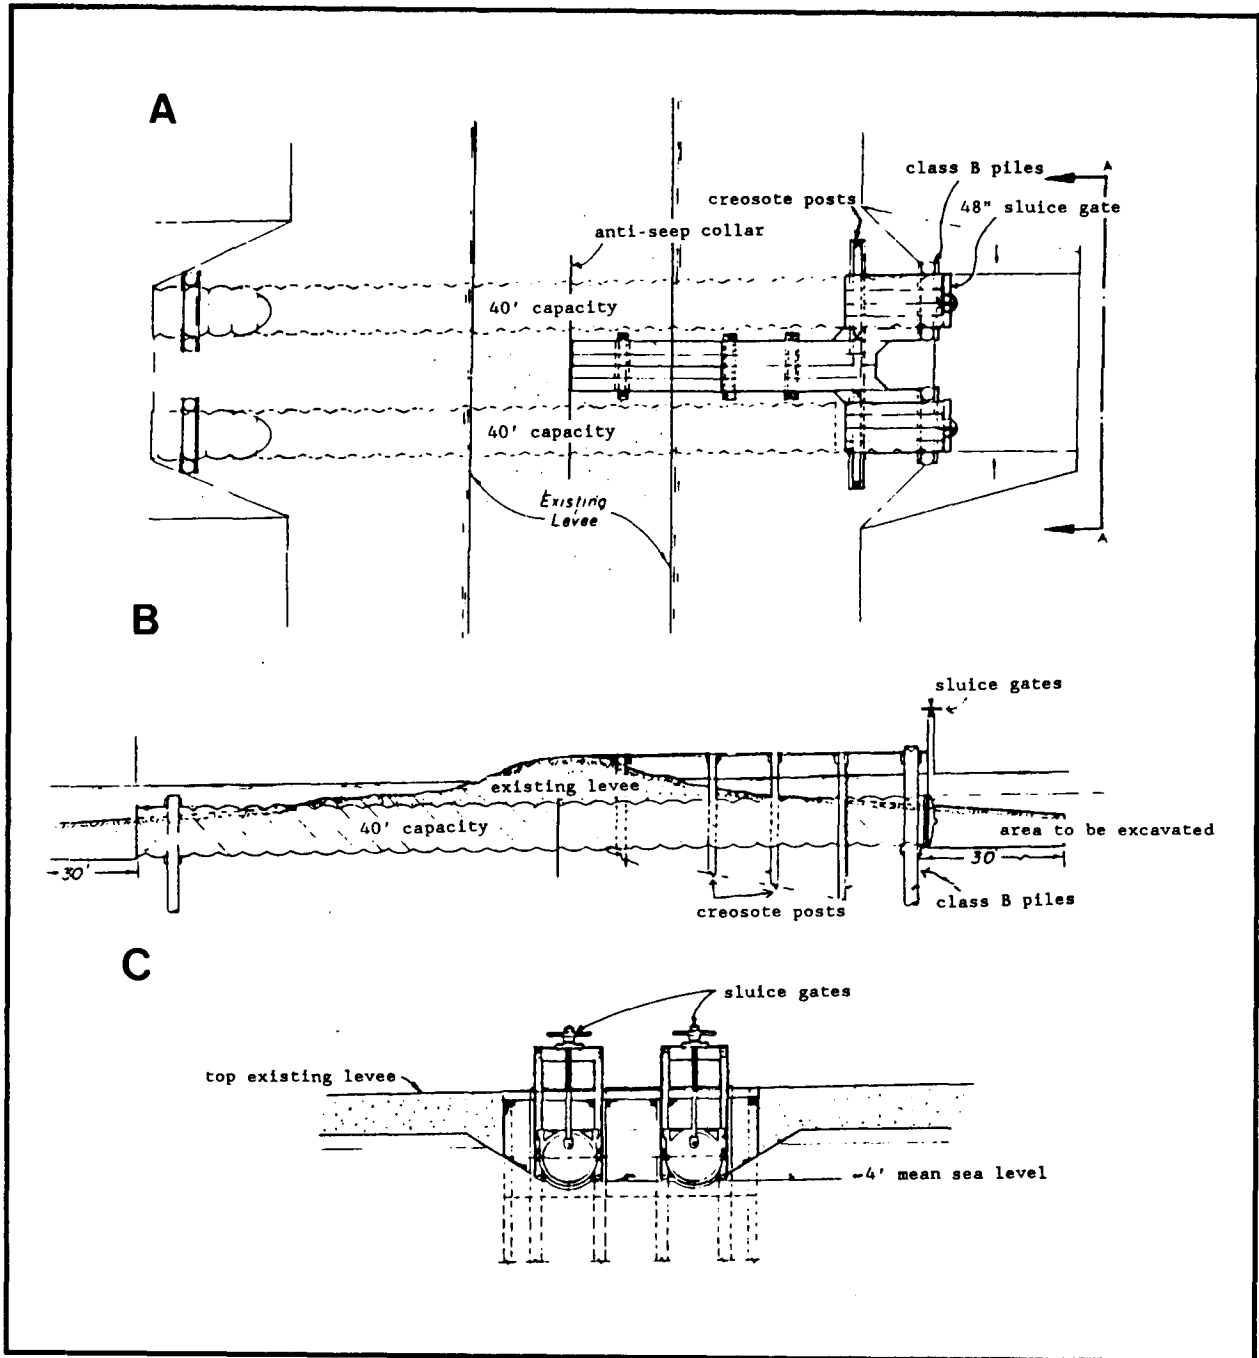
Single screw gate culvert: A) plan; B) cross-section at 48" sluice gate; C) view A-A' (adapted from Fenstermaker and Associates, Inc. 1985).
